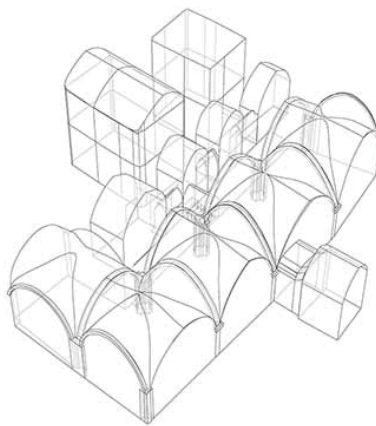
Ardicia: portico placed against the external façades, typical from Ravenna
